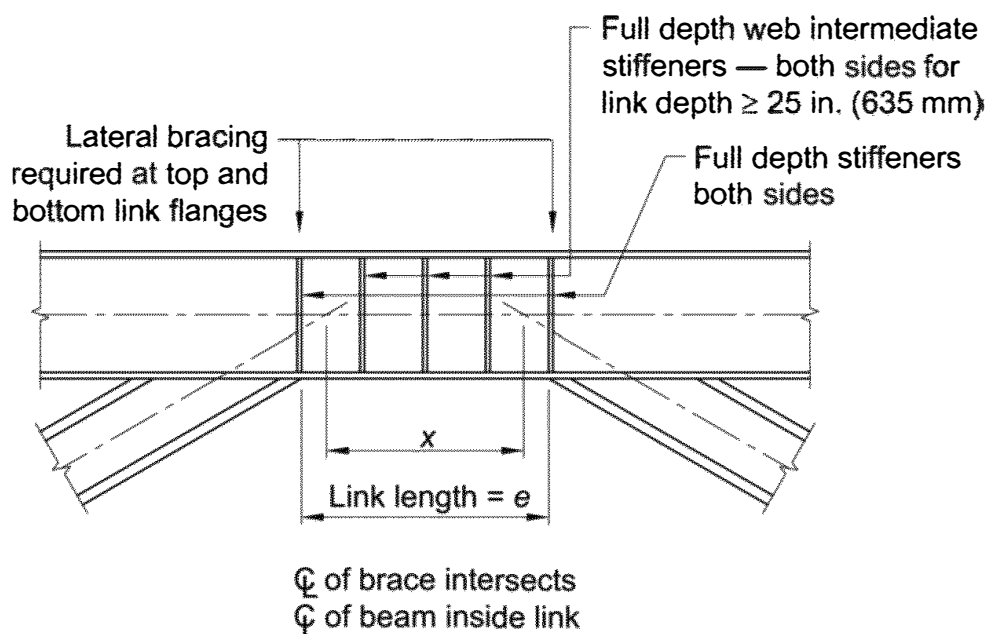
EBF with W-shape bracing ($x < e$).
